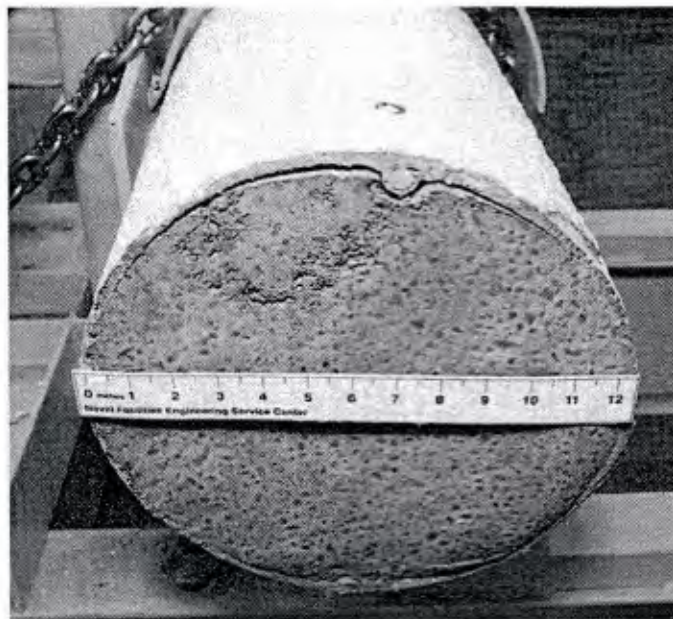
Shrinkage of curing concrete causes separation from external composite shell.
